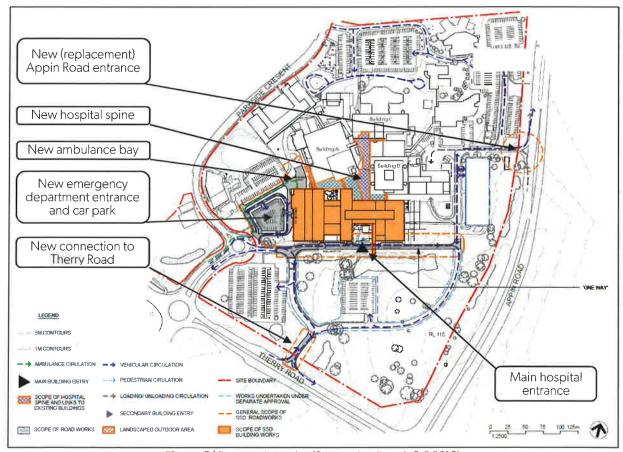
| Proposed site plan (Source: Applicant's RtS 2018)
